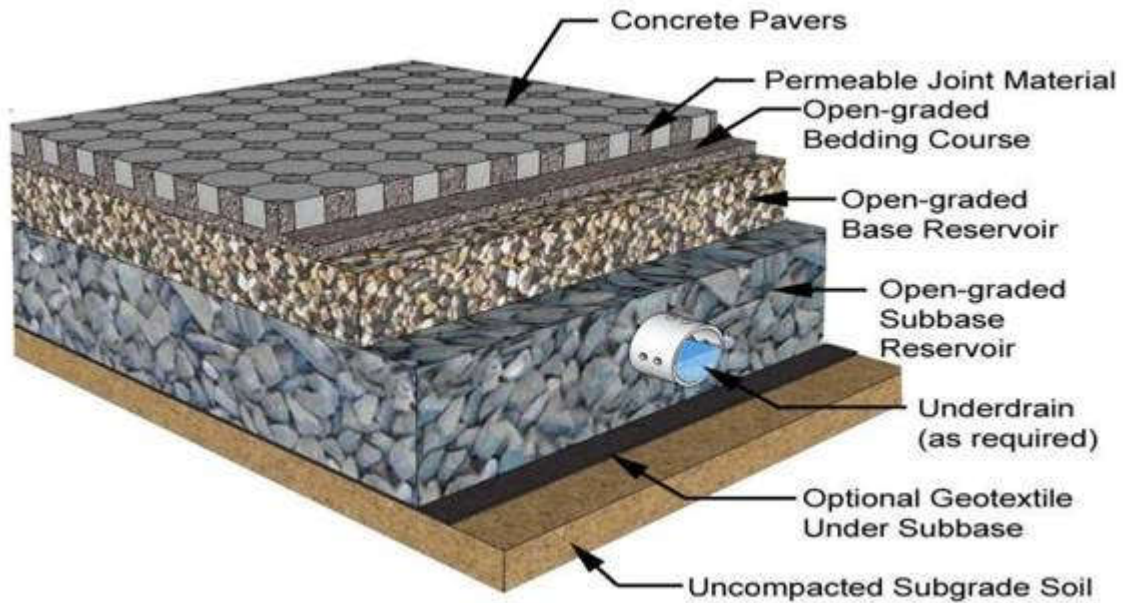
Diagram of a Typical Concrete Paver Permeable Pavement Setup (Source: Caltrans – State of California)
